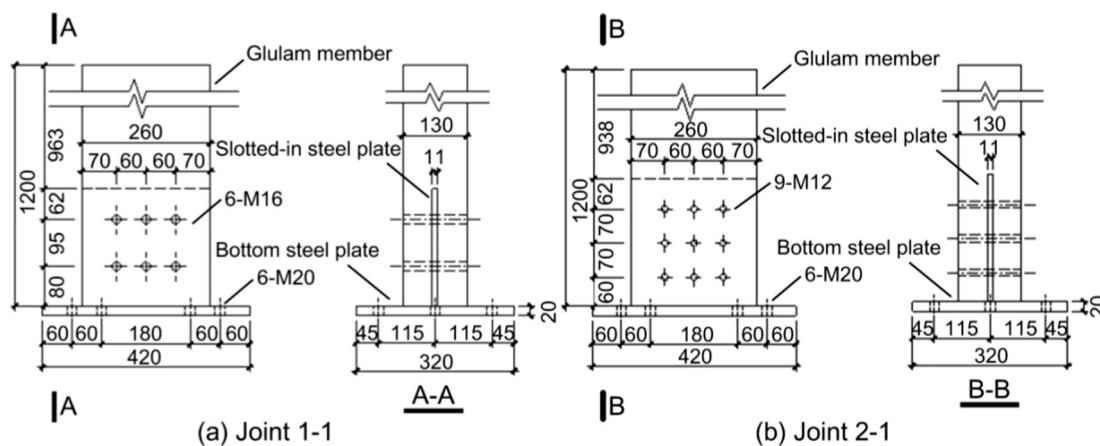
Configurations of Joint 1-1 and Joint 2-1 (dimensions are in millimeter).
